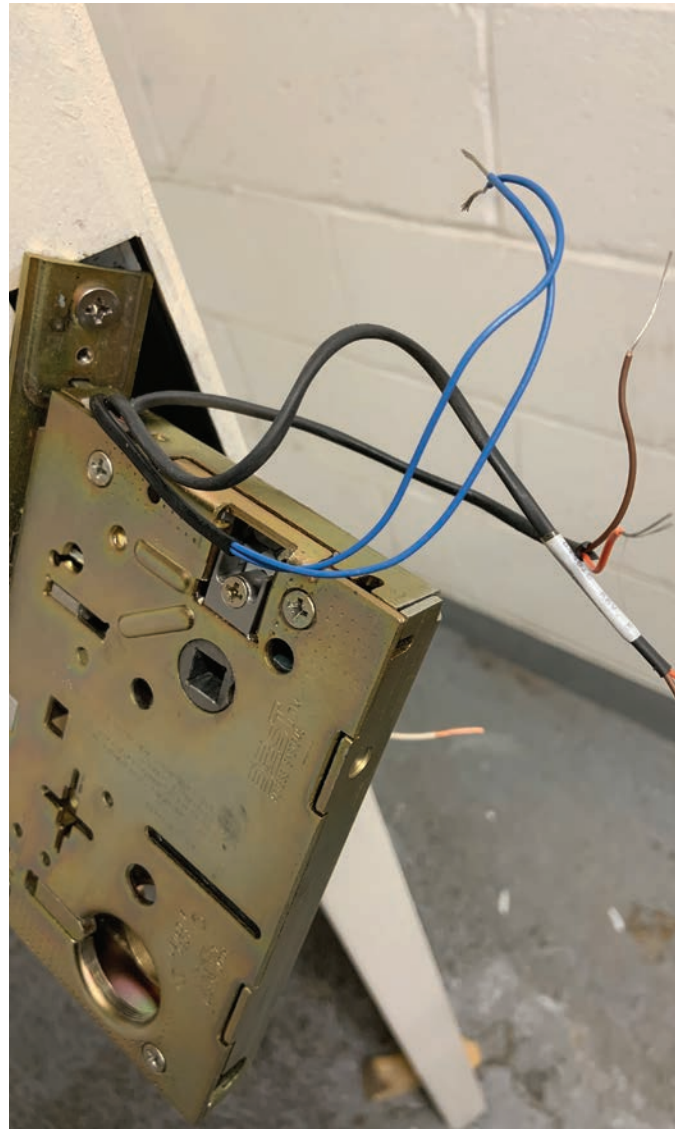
When doing electrified lock replacements, the author uses a screw to hold the chassis on the door to hold it in place.
